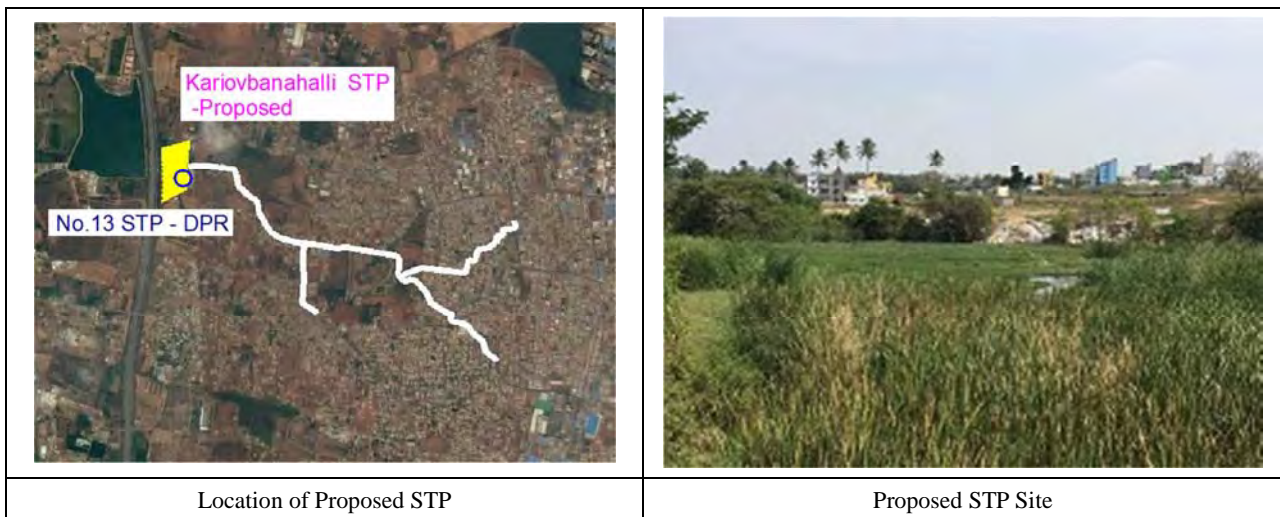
Location of No.13 STP and Alignment of Main Sewer Line
